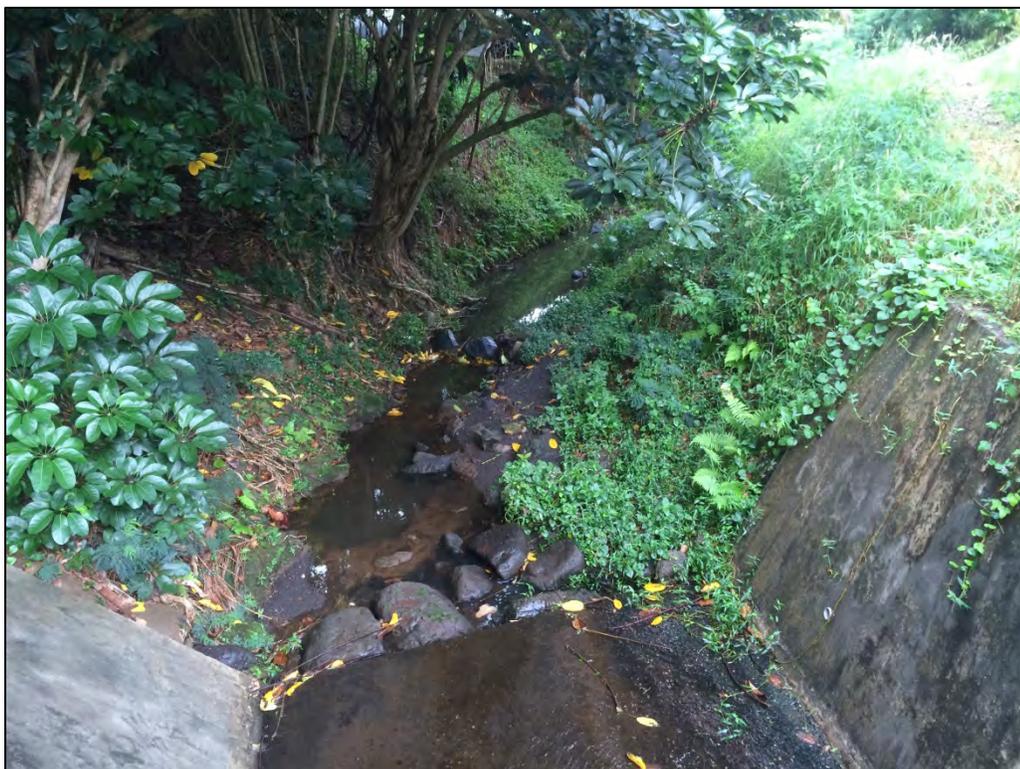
View of Kawa Ditch facing downstream from service road bridge.
